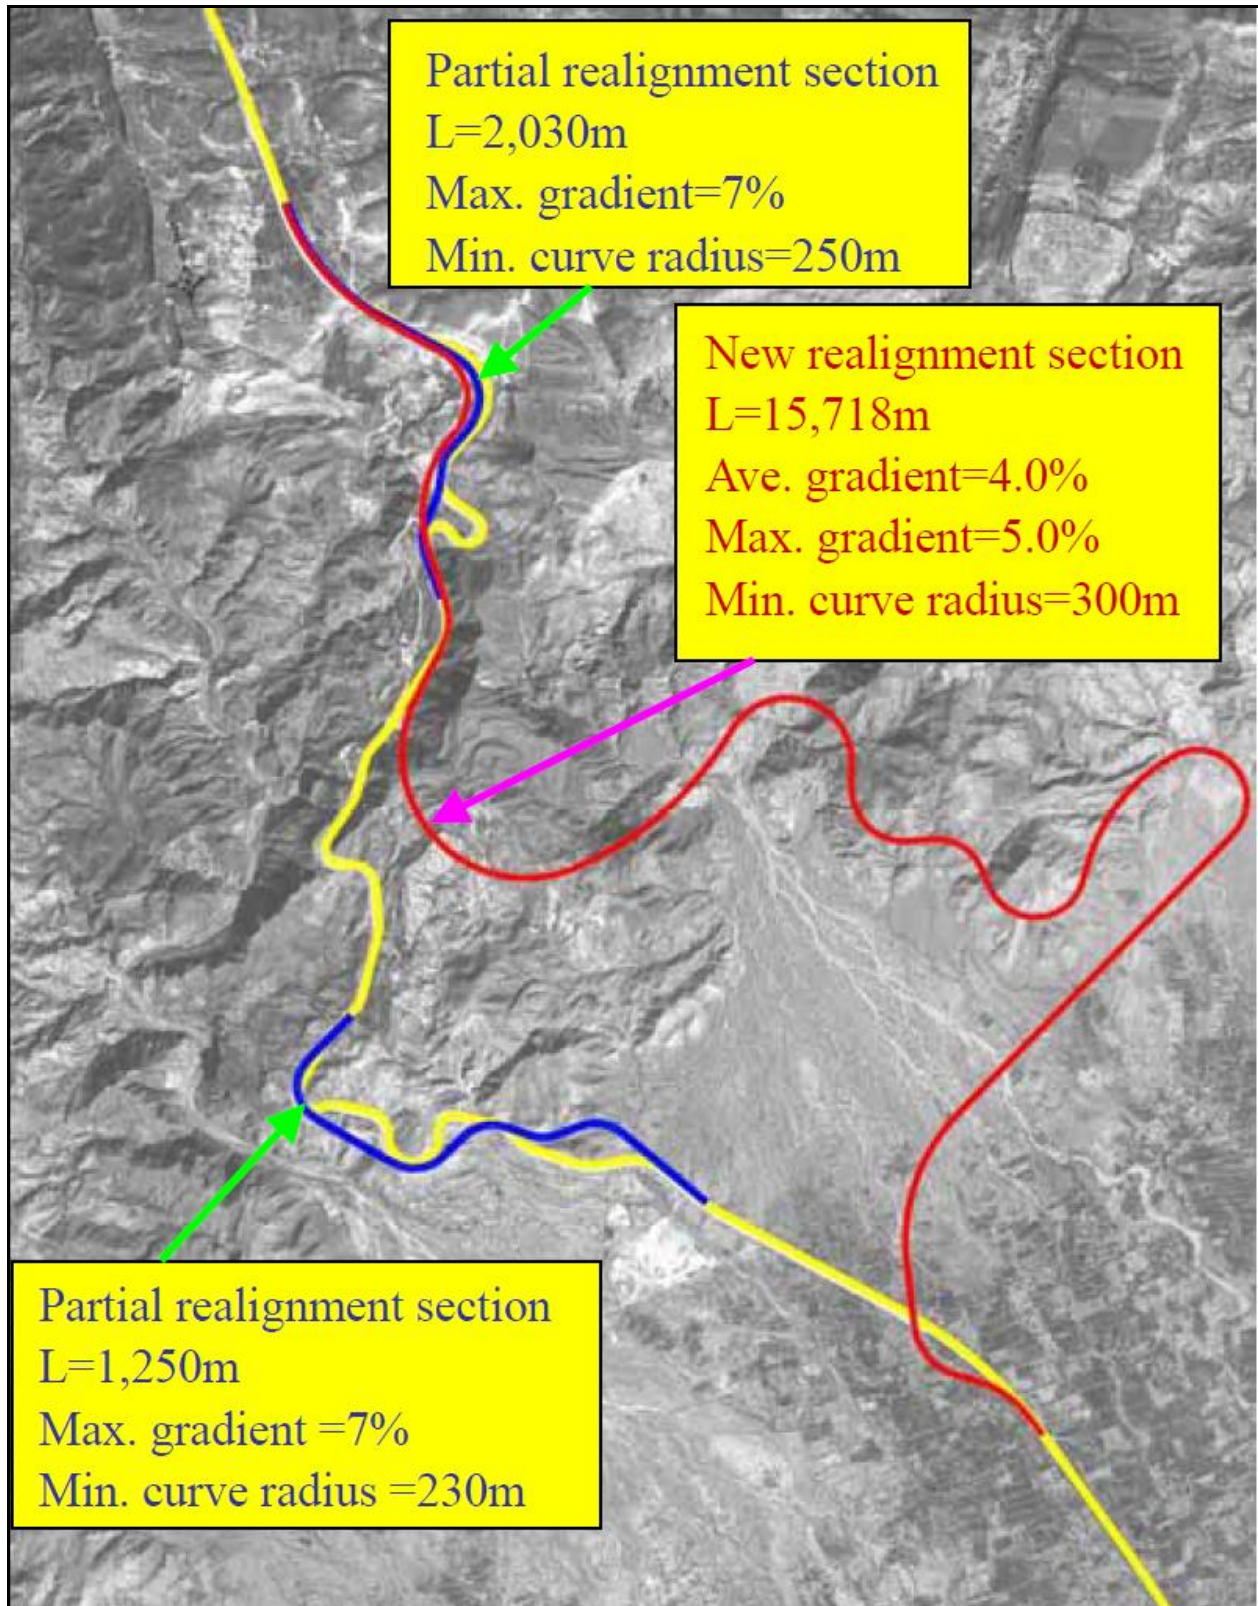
Route Realignment Plan of Alternative-2(Adopted from JETRO, 2008)
